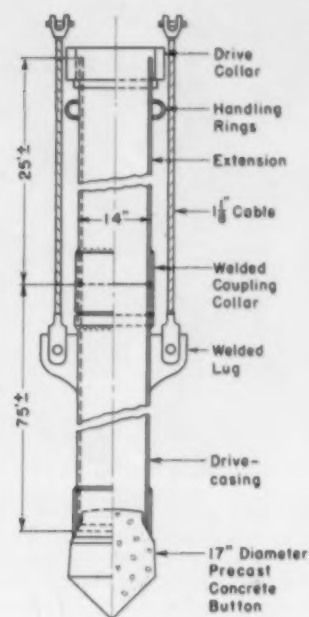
Section of drive casing and extension shows welded coupling collar in place over casing. Lugs placed well down on long casing permit pulling of complete assembly after lower section is driven far below ground surface. Steel cables of 1 1/8-in. diameter connect lugs to eleven-part block used to withdraw entire unit.
